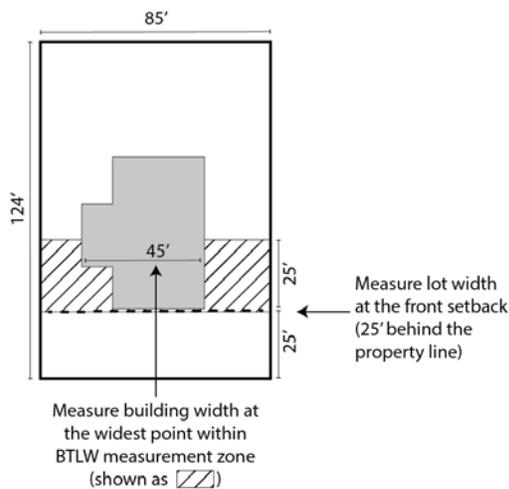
Locations for measuring lot width and building width in order to calculate Building-to-Lot Width (BTLW) ratio
